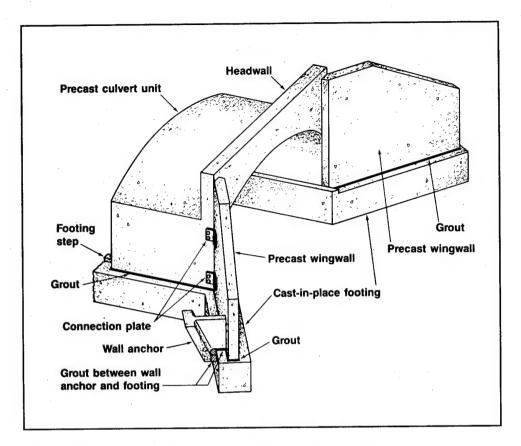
Plan of precast arch-box end section. Headwall is cast as part of the section; precast wingwall is attached during installation (from Hurd 1990)
